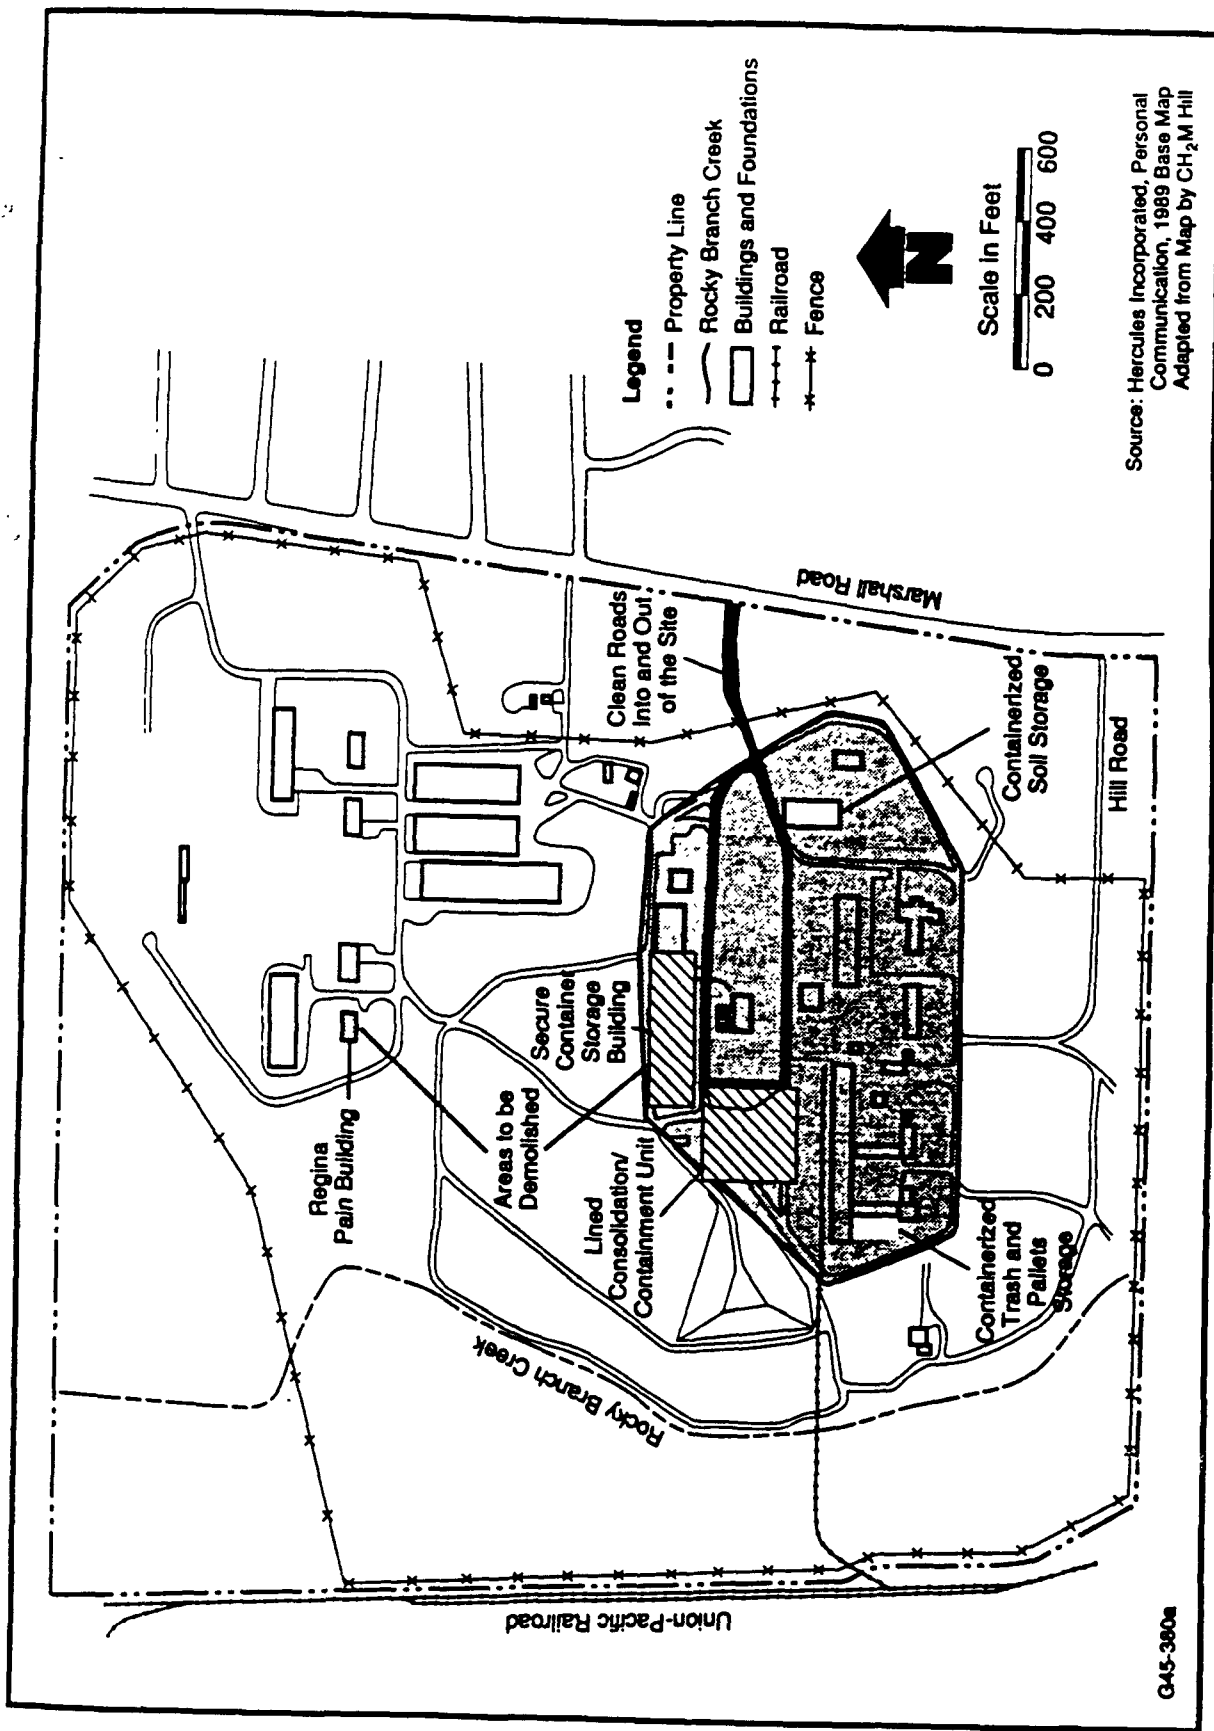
CONCEPTUAL LAYOUT OF ALTERNATIVE 2 - ONSITE SECURE STORAGE
